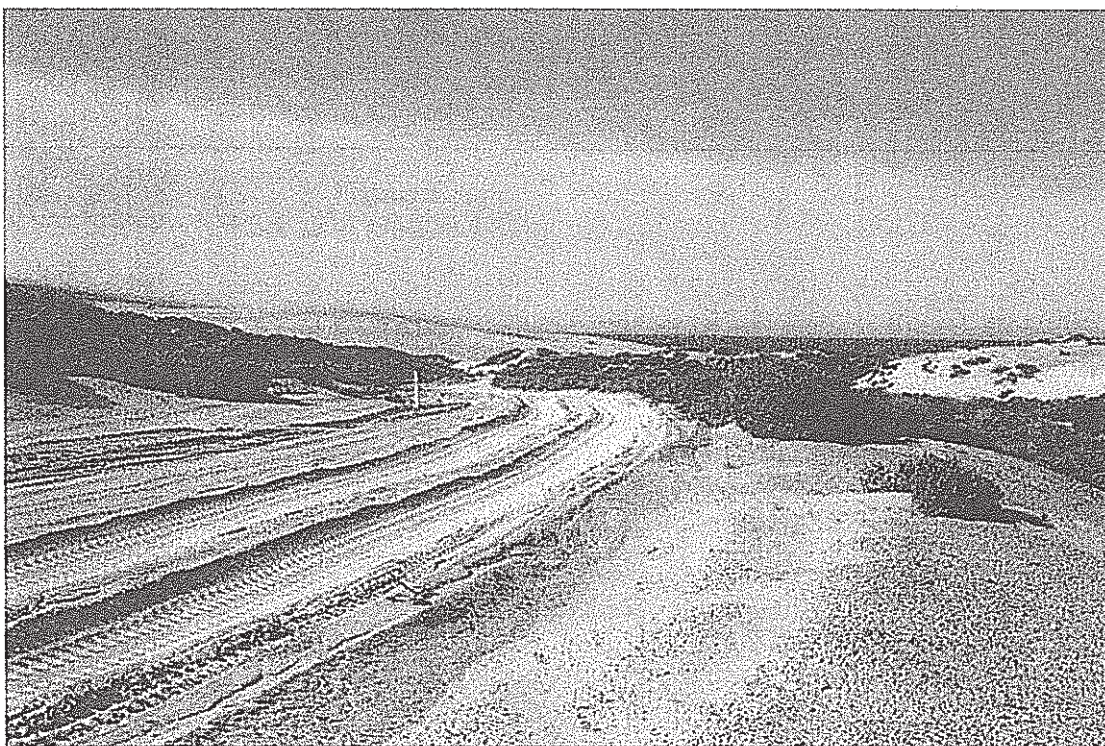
A: Access road with gravel on edge of Gordon Sand easement (Road Site)
